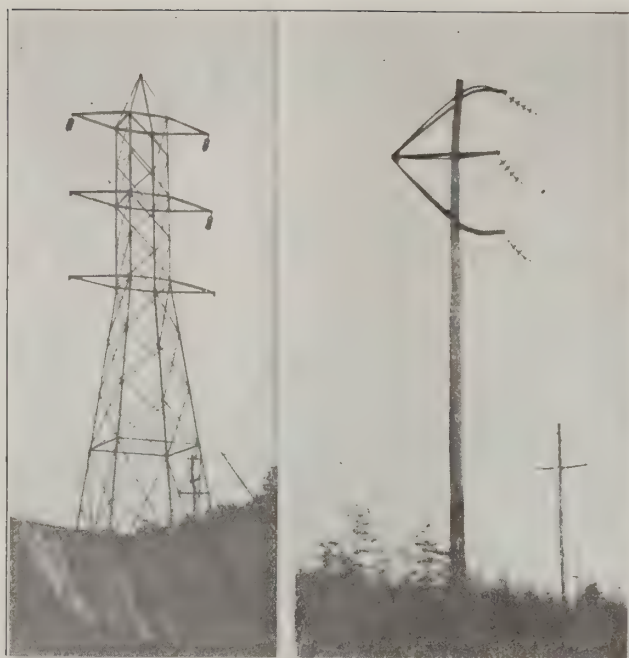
TYPES OF STEEL TOWERS AND WOOD POLE CONSTRUCTION.
